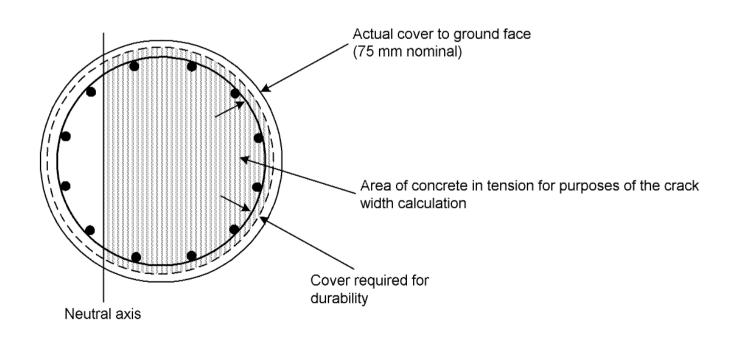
Pile cross section showing crack width calculation principles to EC2 as applied on the Copenhagen Metro project.
